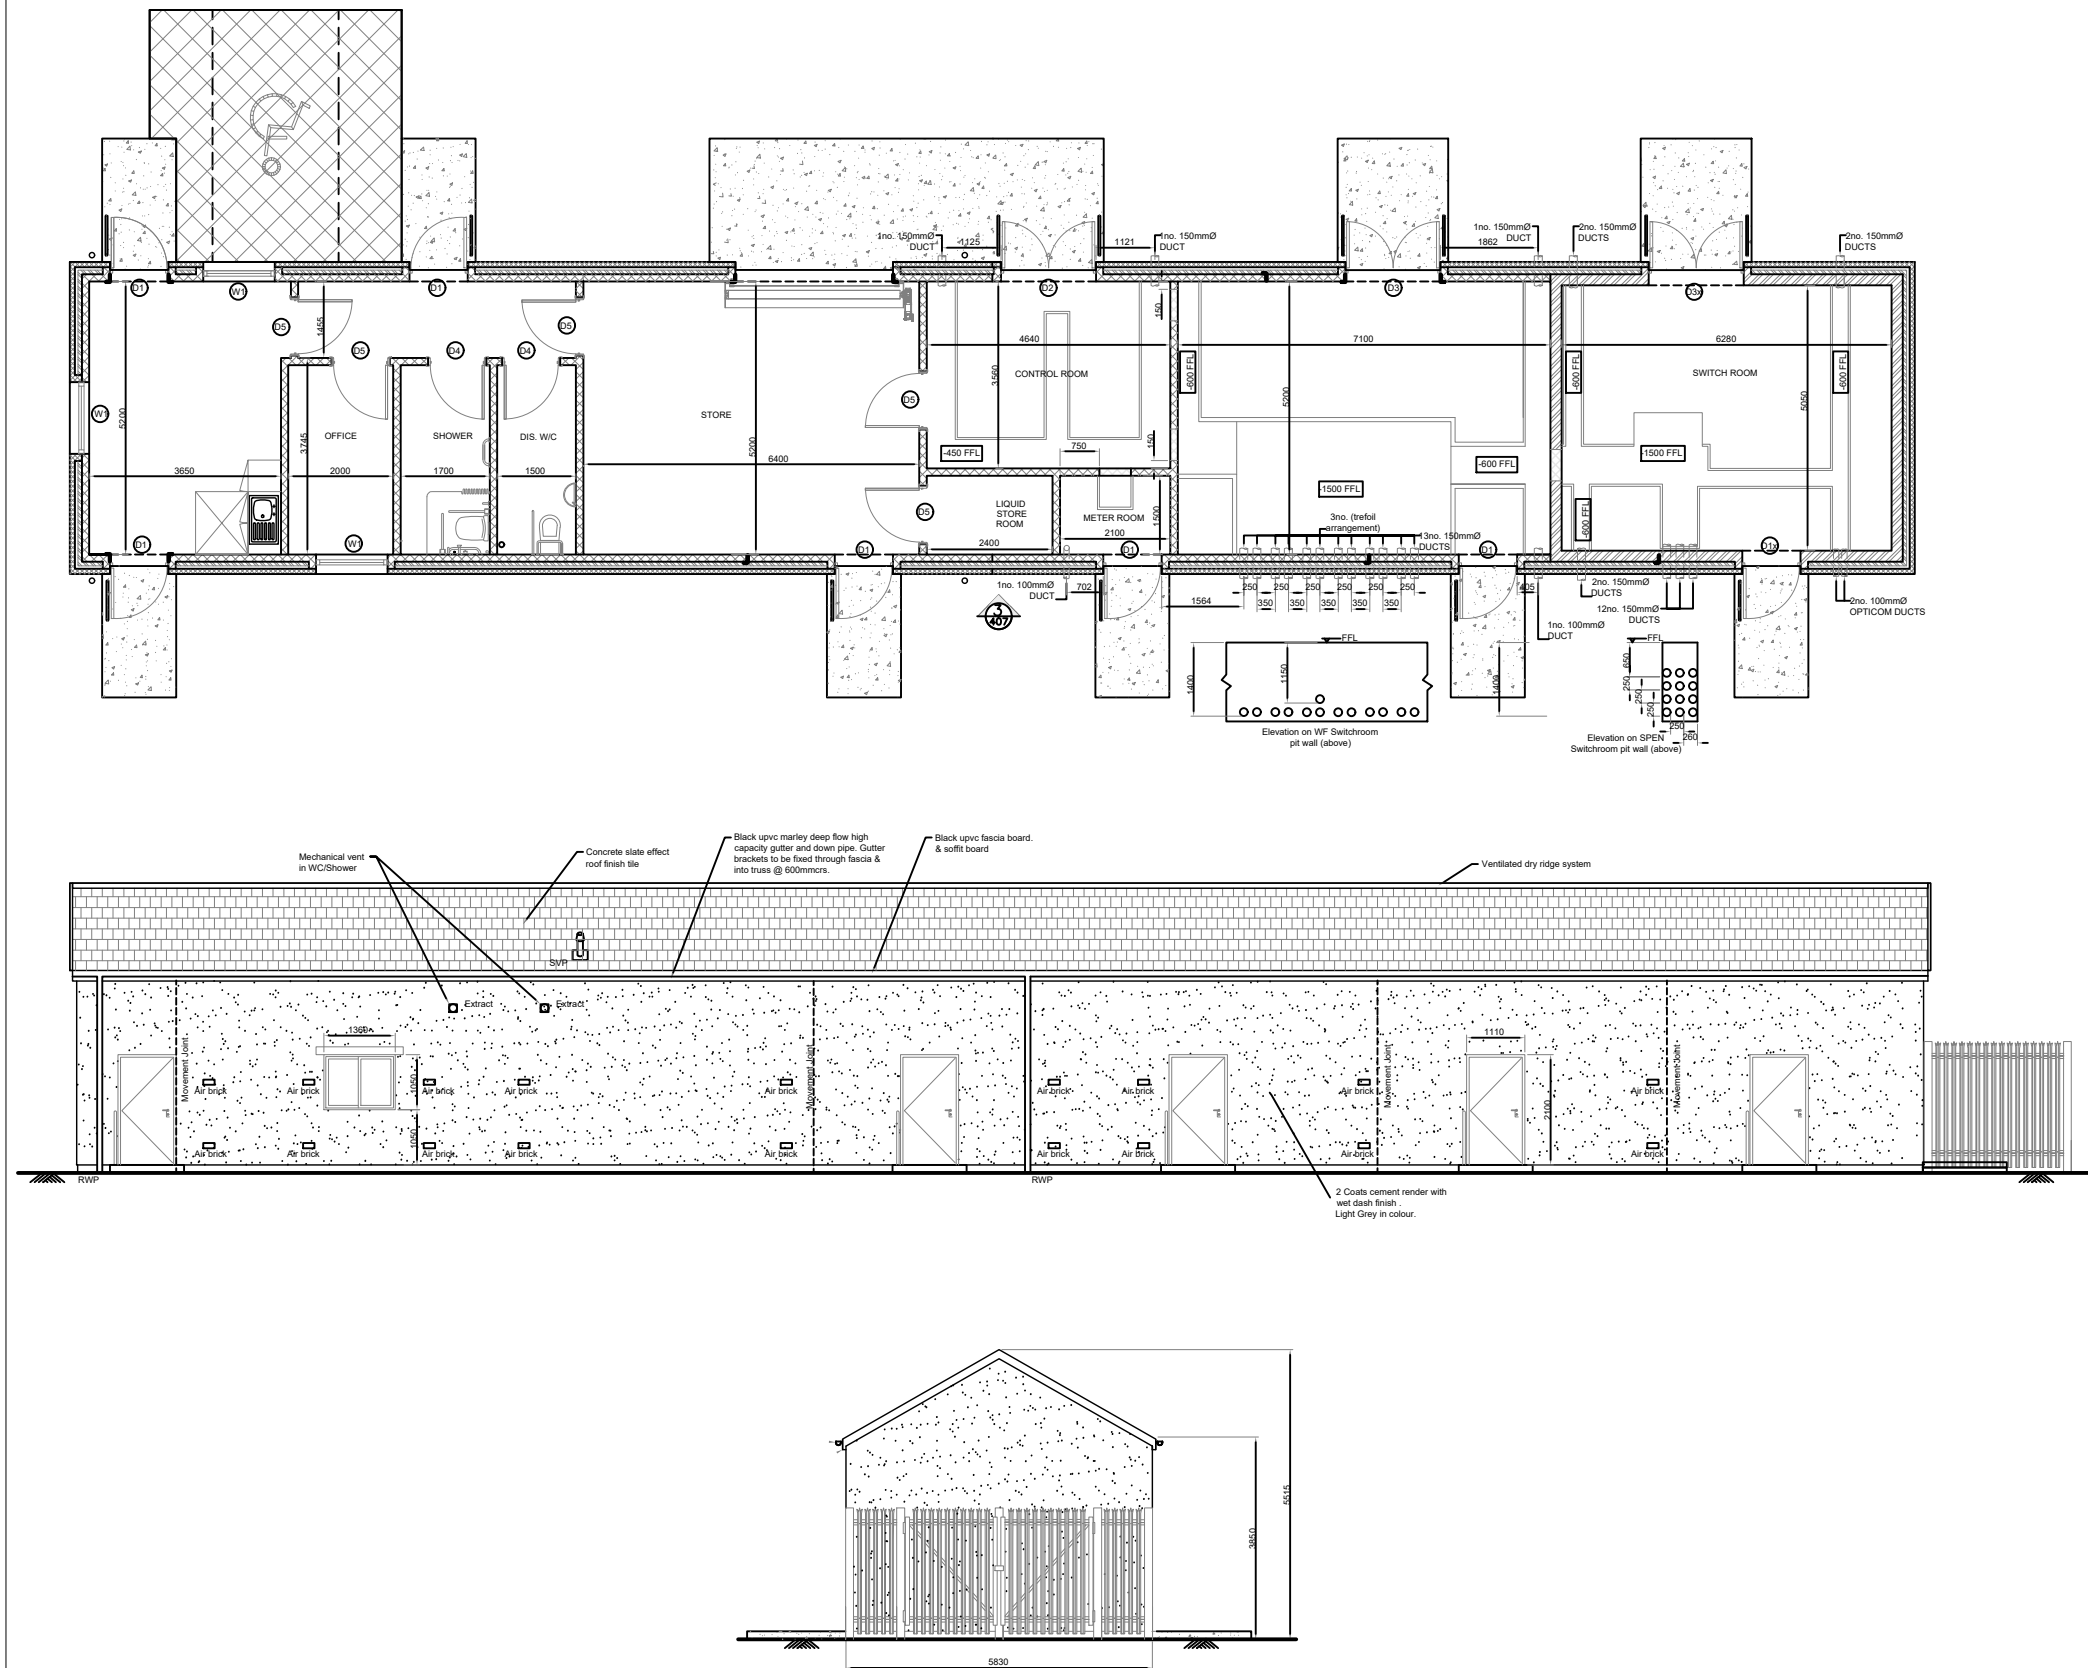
Typical Onsite Control Building - Plan and Elevation
